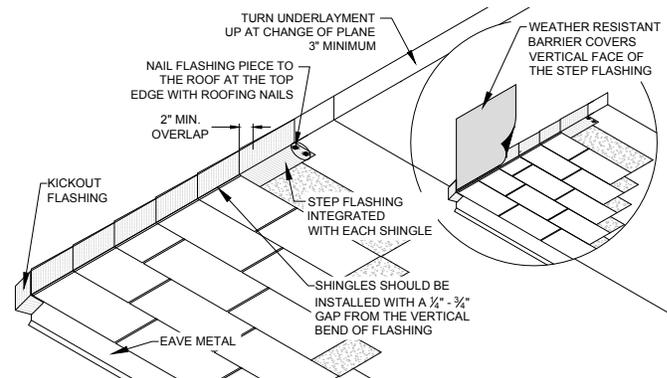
Step Flashing Application at Roof-to-Sidewall Transitions
